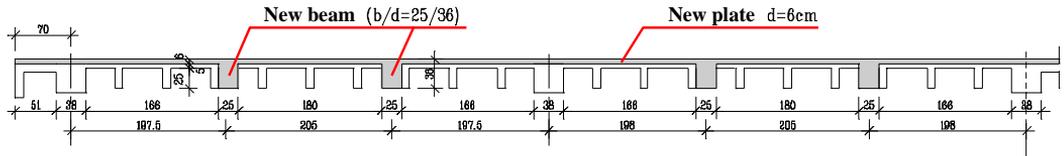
The arrangement of the new RC beams and the slab in the existing floor structure
